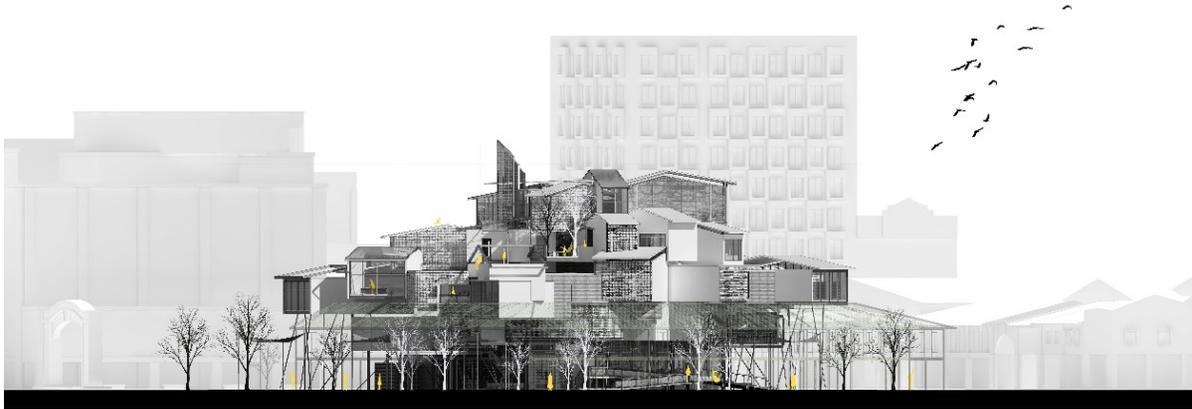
Elevation of the Final Design (Johor Bahru City Gallery)
